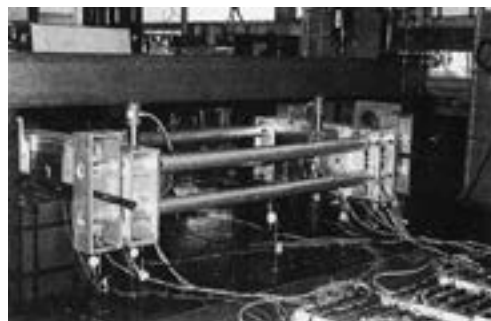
Strength test of a beam joint.⁶⁵⁾
